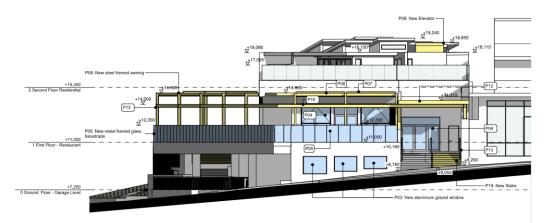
Proposed South-west elevation - 1605 Anzac Parade
